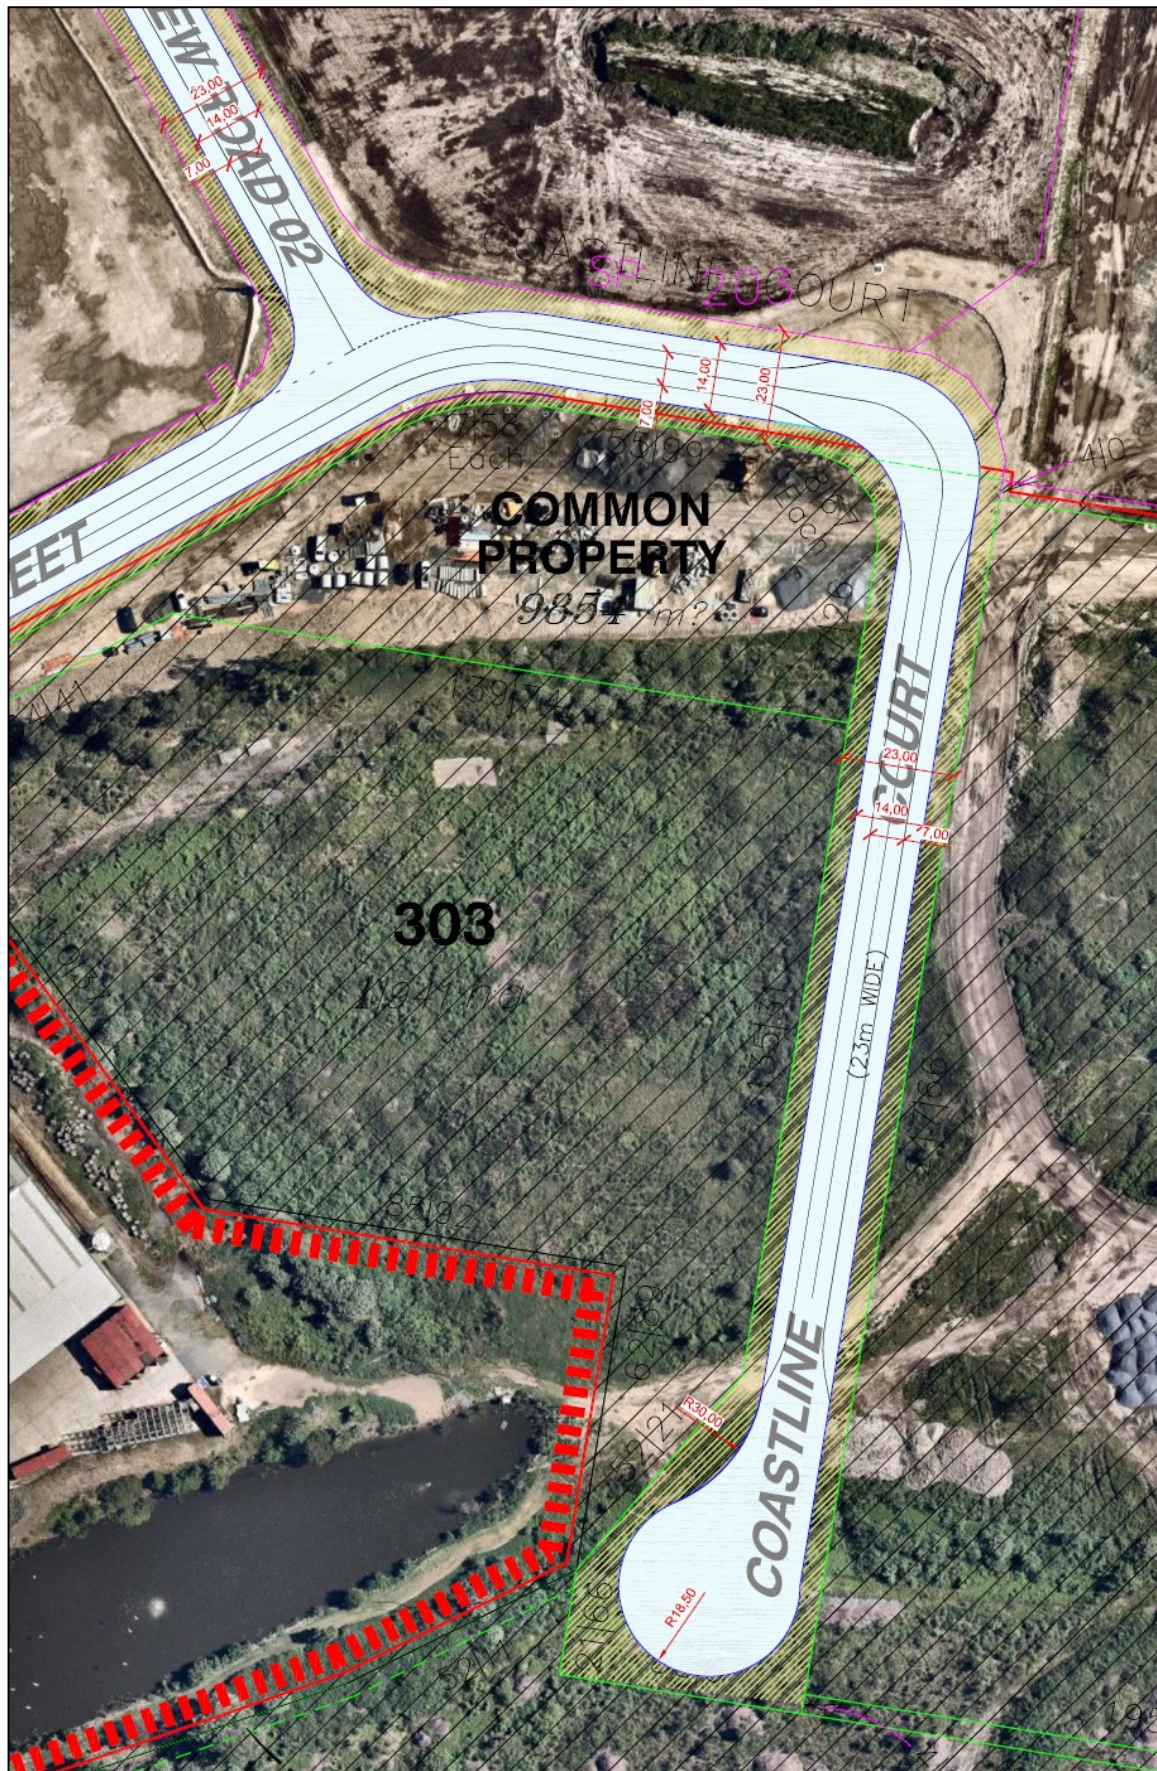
INTERNAL ROAD LAYOUT (DETAIL)
